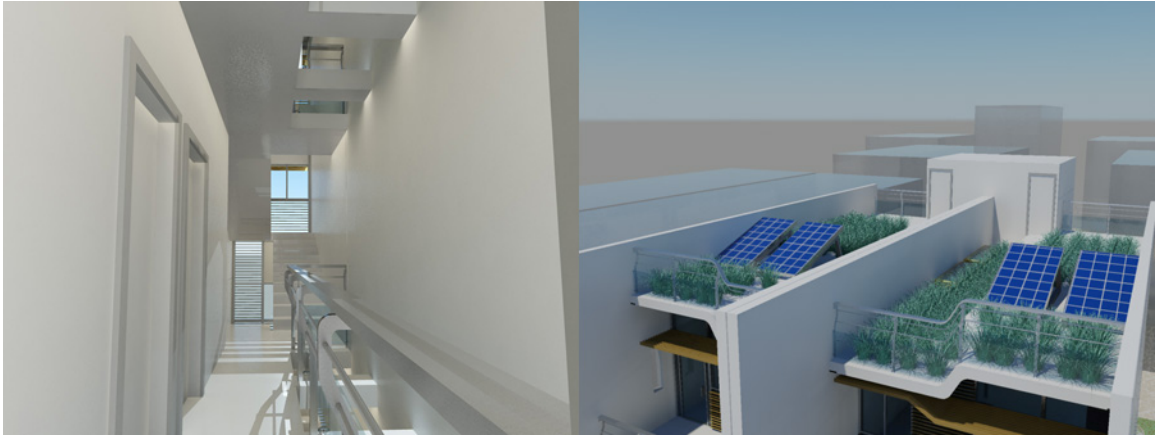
Perspective Rendering of Hallway (left) and Rooftop (right)
